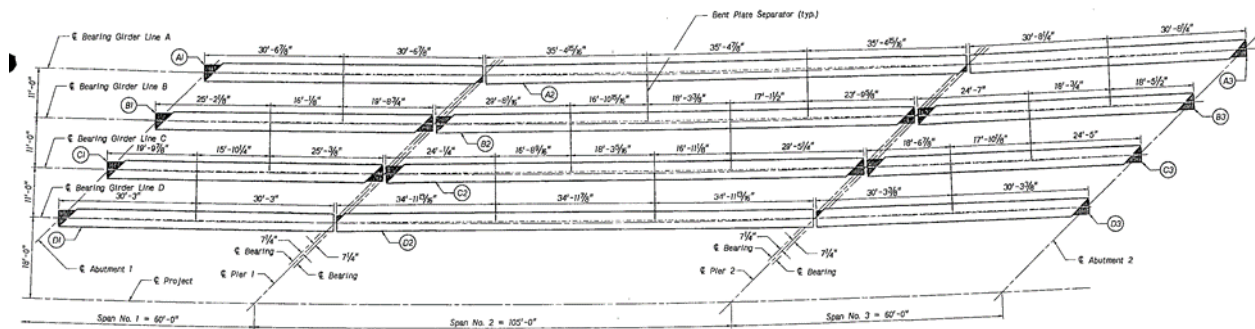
Plan view from the construction documents of Scottsbluff Gering Bypass bridge system, courtesy of NDOT
